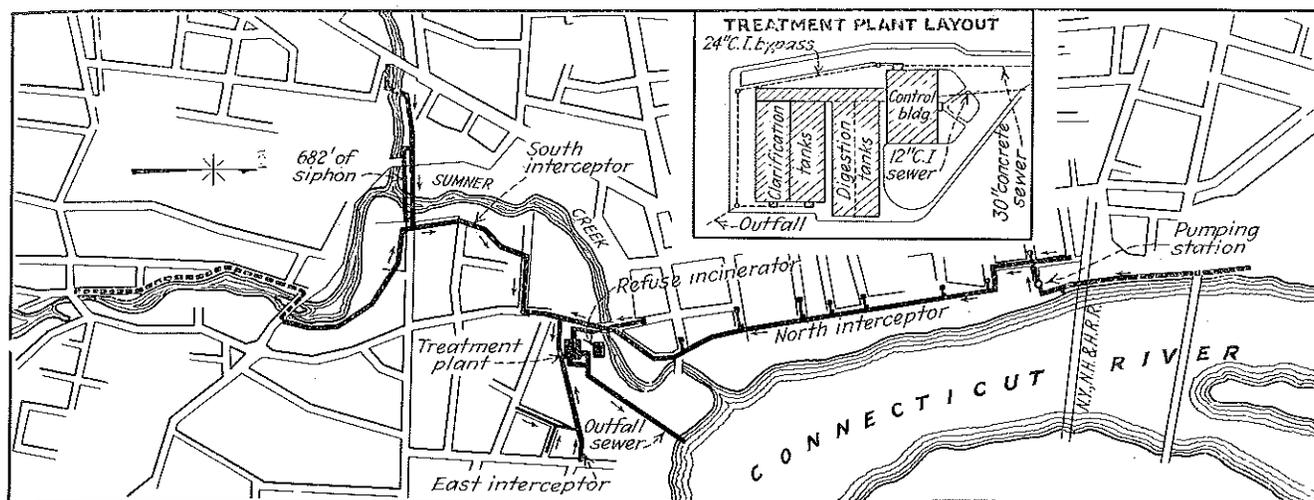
LOCATION PLAN OF INTERCEPTING SEWERS AND GENERAL LAYOUT OF SEWAGE DISPOSAL PLANT
